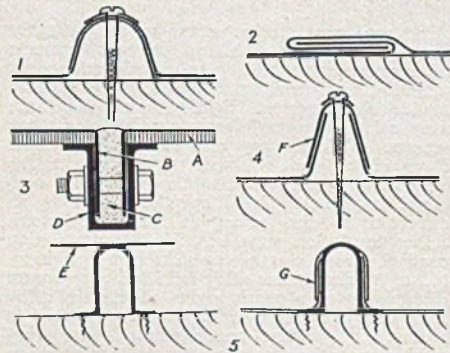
Five types of roof joint for aluminium sheeting: 1, single roof lap; 2, interlocking lap; 3, rib and panel joint (A—sheet metal panels on fibre board, B—panel flanges, C—mastic filling, D—rib section); 4, cover strip joint (F—cover strip forced over sheet upstands); 5, extruded joint section. Diagram at left illustrates form of section before laying roof sheets (E—flanges as extruded). Diagram at right shows form of section after laying roof sheets (G—flanges turned down over sheet upstands).
